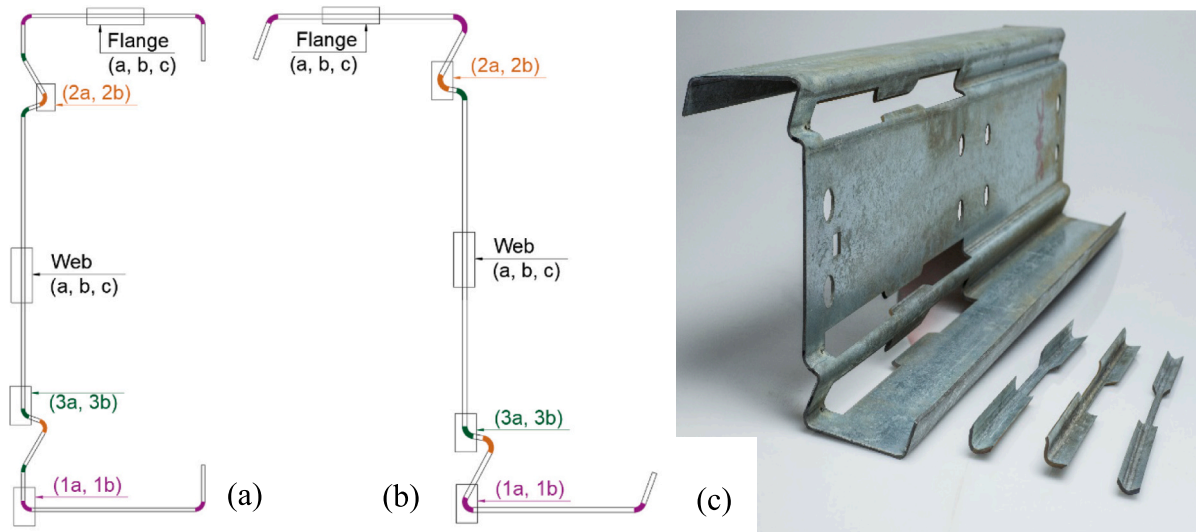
Locations of extracted tensile specimens (a) channel cross section, (b) zed cross section, and (c) typical curved specimens wired cutting from the section Z-W145T1.2 and specimens extracted from curved locations 1, 2, and 3.
